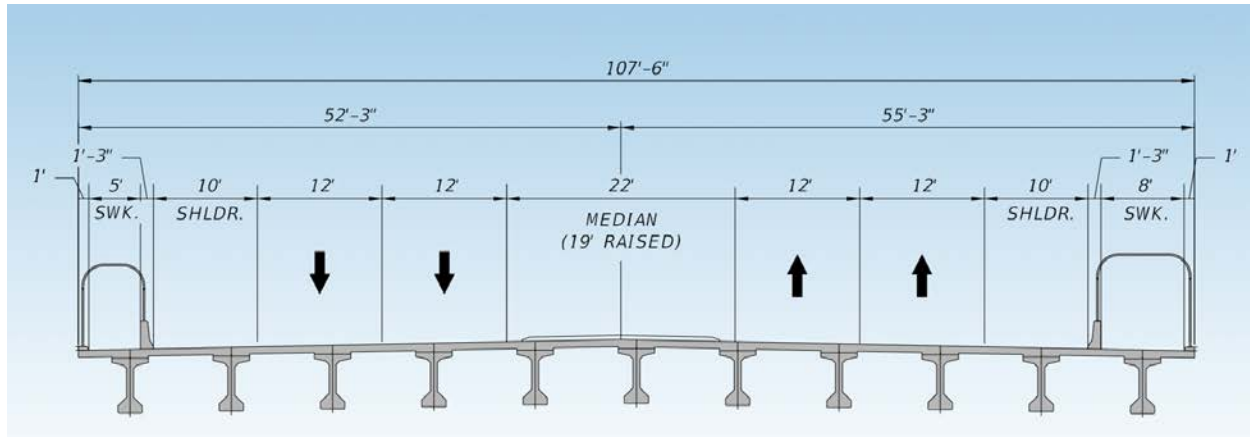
depicts the existing bridge typical section for the Central Boulevard Bridge over I-95. Two 12-foot through lanes with a 10-foot wide outside shoulder are provided in each direction. An eight-foot wide sidewalk is provided on the west side and a five-foot wide sidewalk is provided on the east side of Central Avenue. The eastbound and westbound lanes are separated by a 22-foot median (19 feet raised). The total out-to-out width of the existing bridge is 107 feet-six inches.
